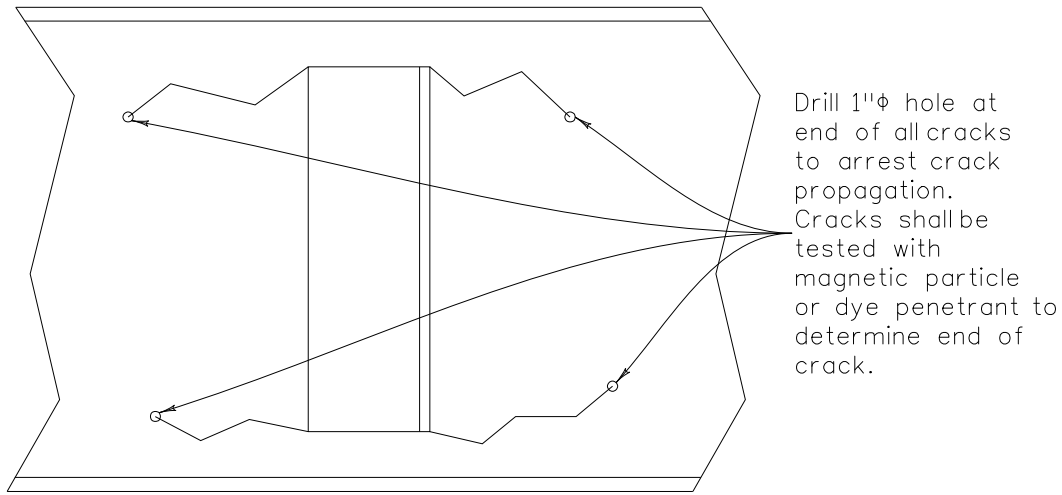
(K)-3 Sample Detail of Drilling Holes at the end of Fatigue Cracks
